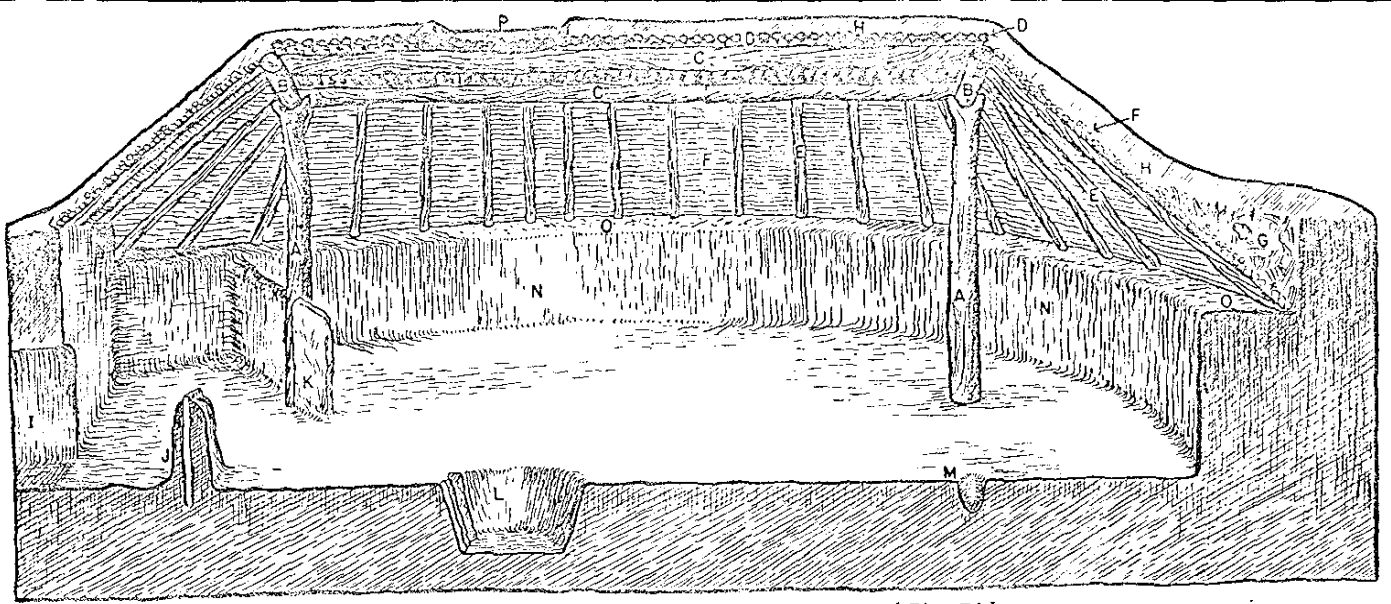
Postulated Method of Roof Construction of First Pithouse
